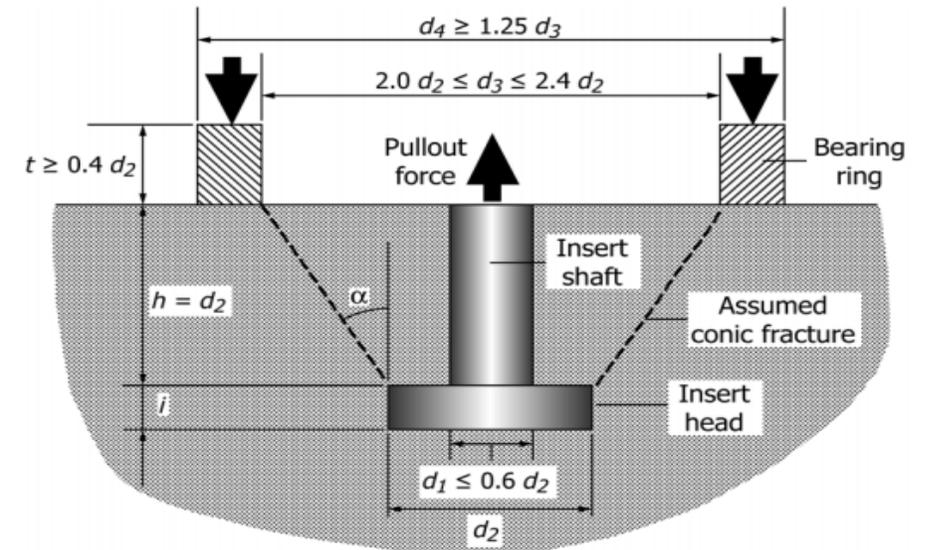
Schematic Cross Section of Cast-in-Place Pullout Test
